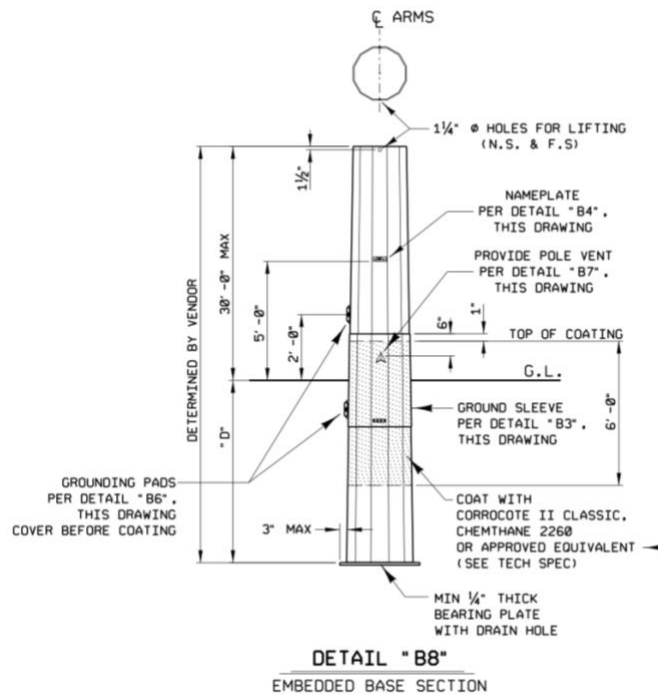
Example Drawing of an Embedded Base Section for Galvanized Steel Poles (CAD drawing provided by the Omaha Public Power District)
